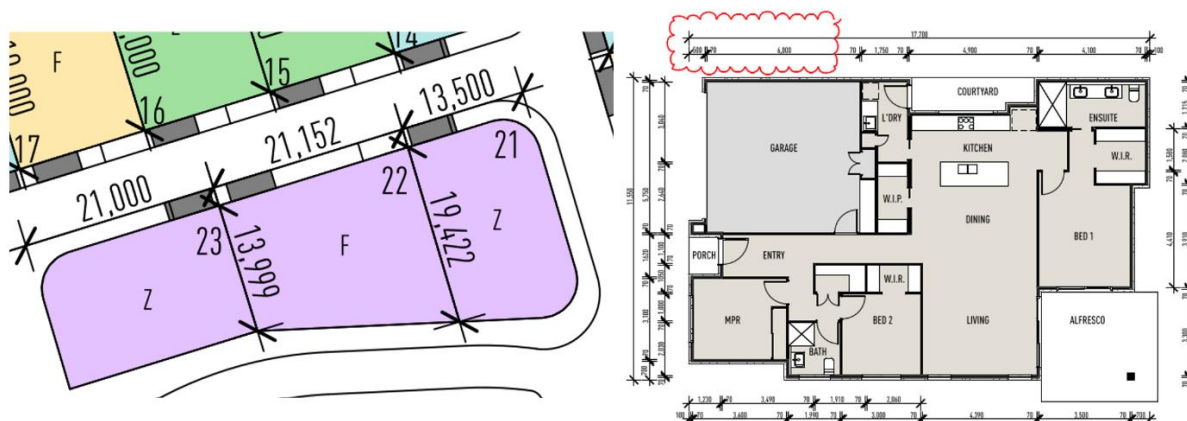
Indicative lots 21-23 and dwelling (villa) type A floor plan to show villas cannot be orientated to the north and do not match the location of the driveways
